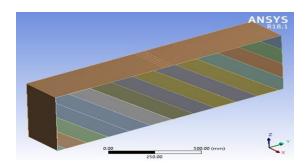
Modelling of beam with 45<sup>0</sup> side wrap
